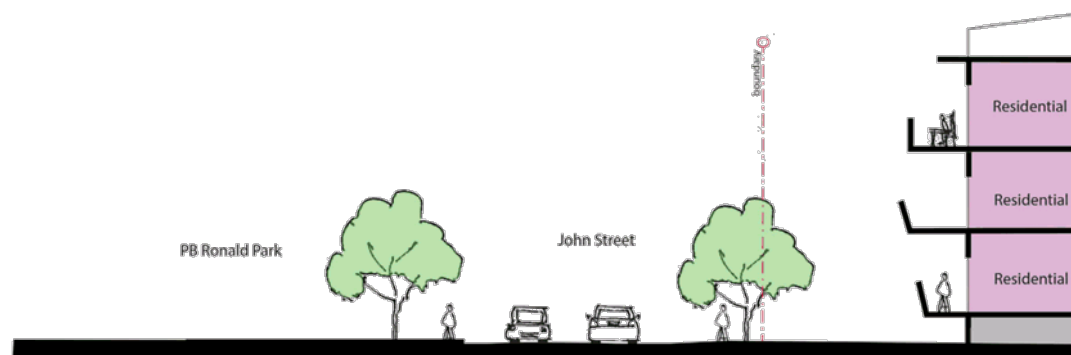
Indicative cross section of future built form siting in Precinct 7
